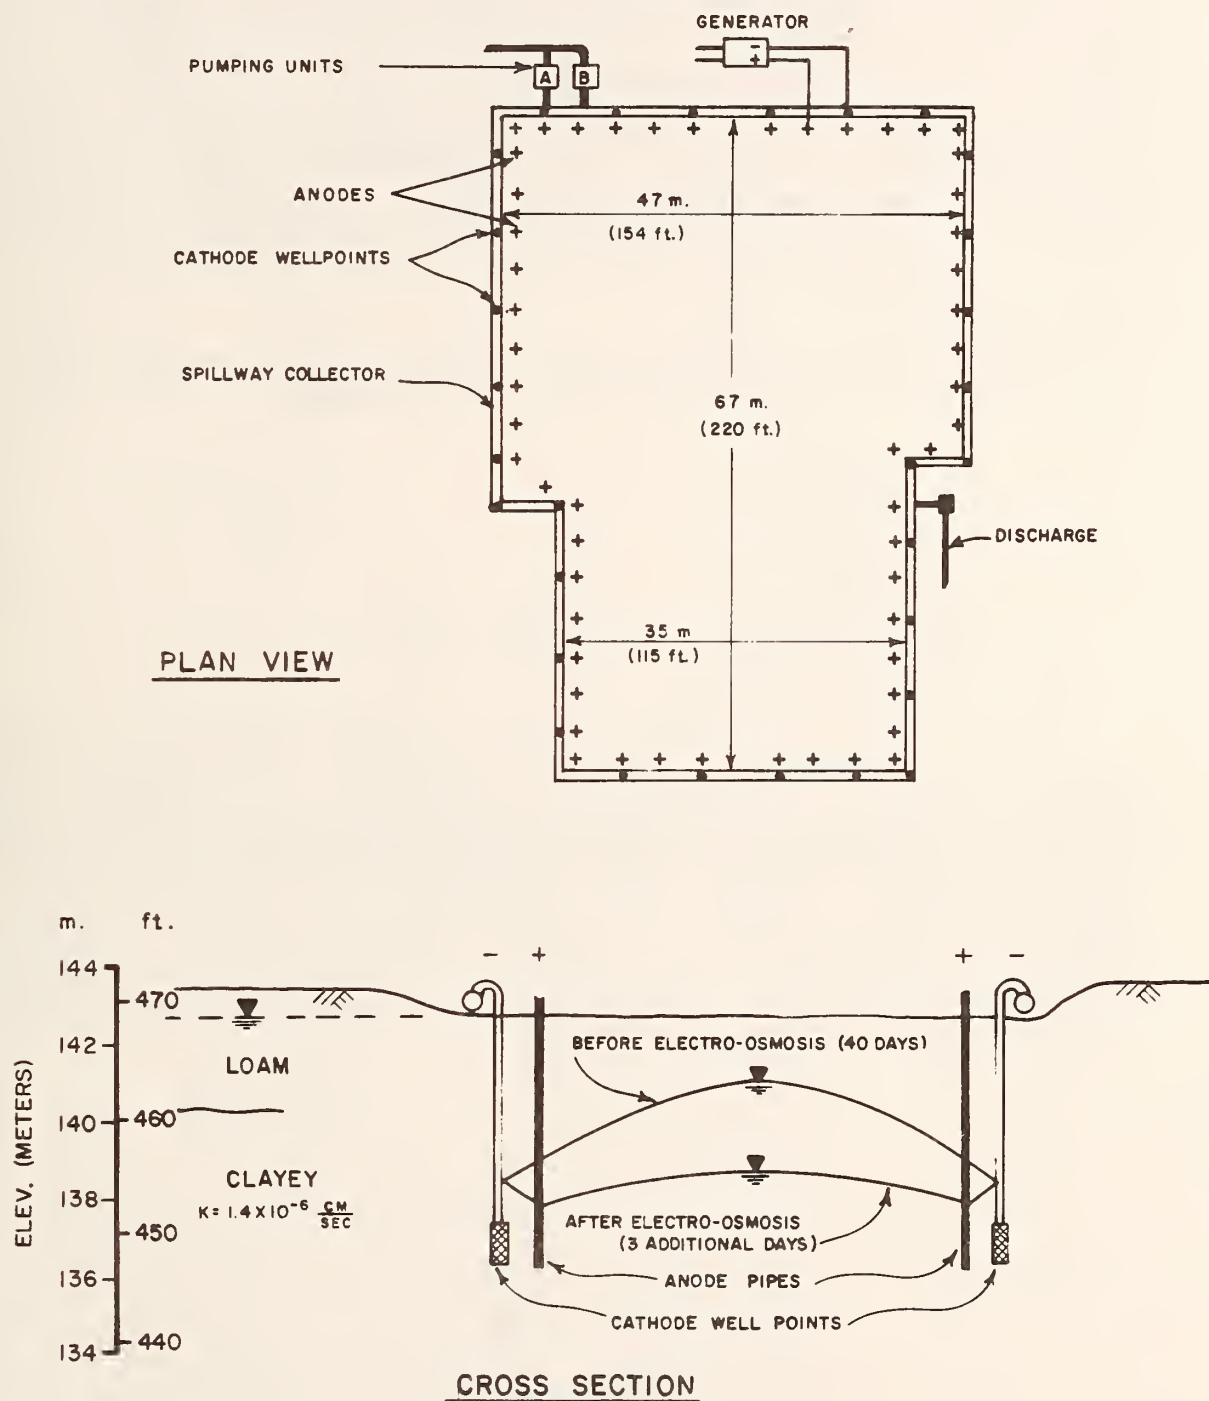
Open Cut Stabilization in USSR (Ref. 169)
